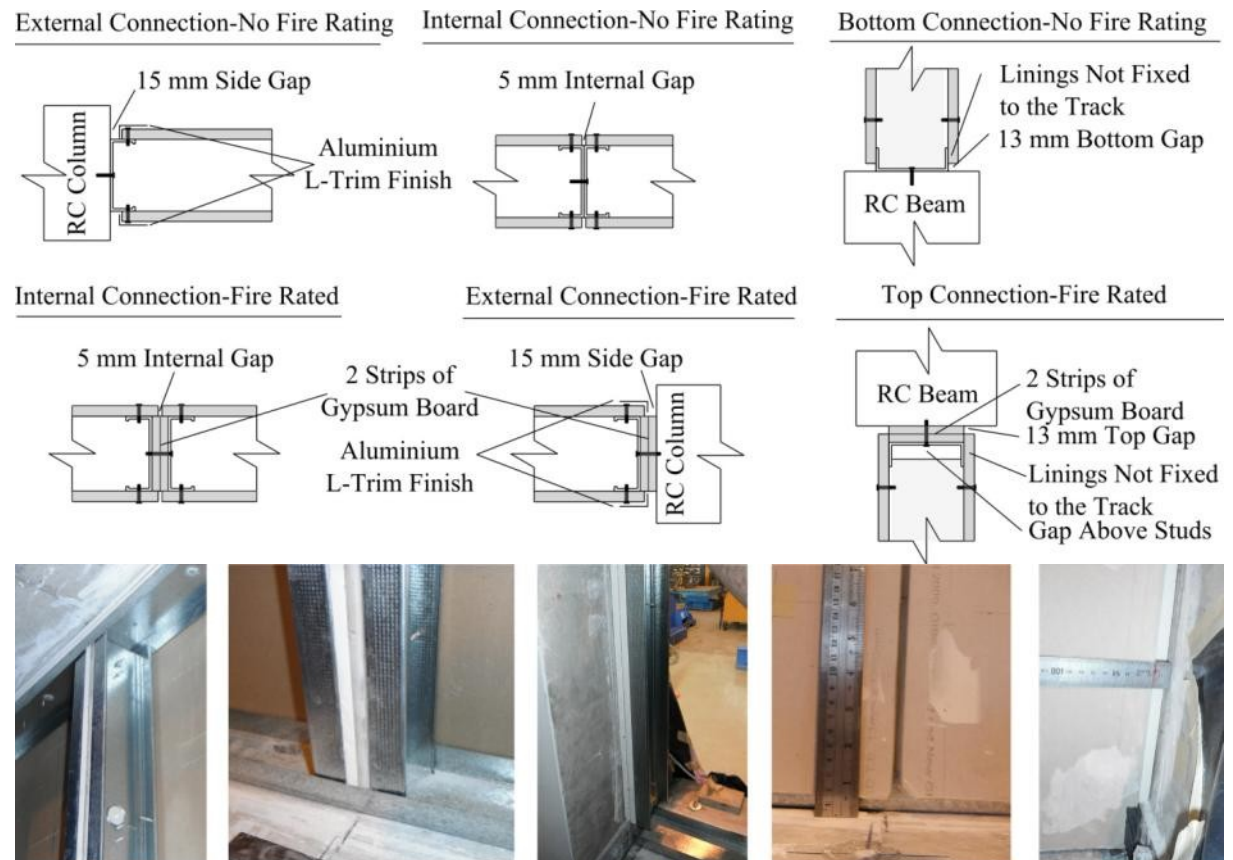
Adopted details in MIF1-STFD (Low Damage steel framed drywall) Note: The linings are only attached to the vertical studs
